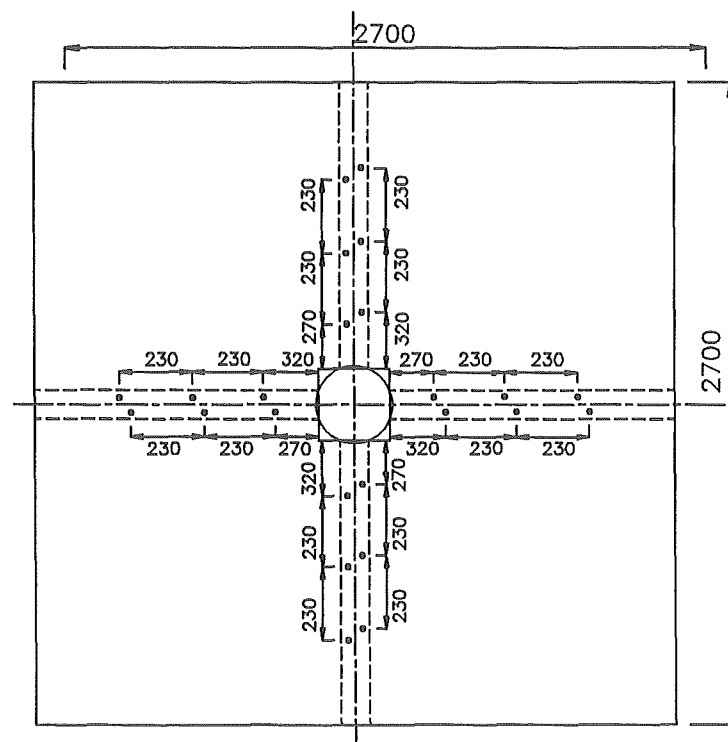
Standard arrangement of shear studs for series 4 tests (CHS/RHS)
